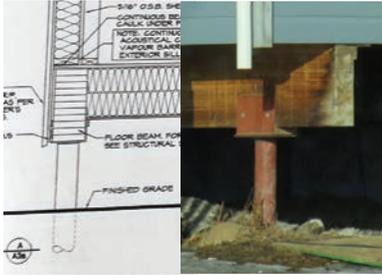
Floor Beam (left) vs Grade Beam (right) saddled to Steel Pile
